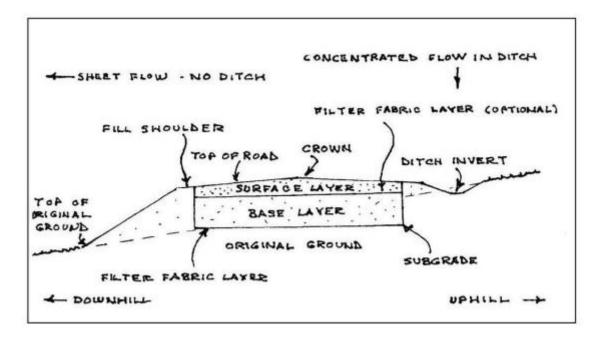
Typical Road Cross-Section - Canaan, NH Highway Department
